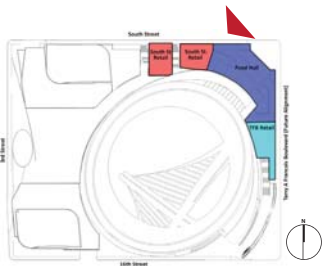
| SOUTH STREET FROM NW CORNER OF BRIDGEVIEW WAY
